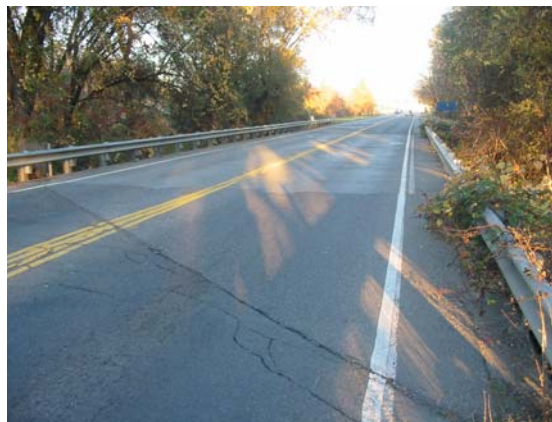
SR 32 Bridge Over Dead Horse Slough (Looking East)
